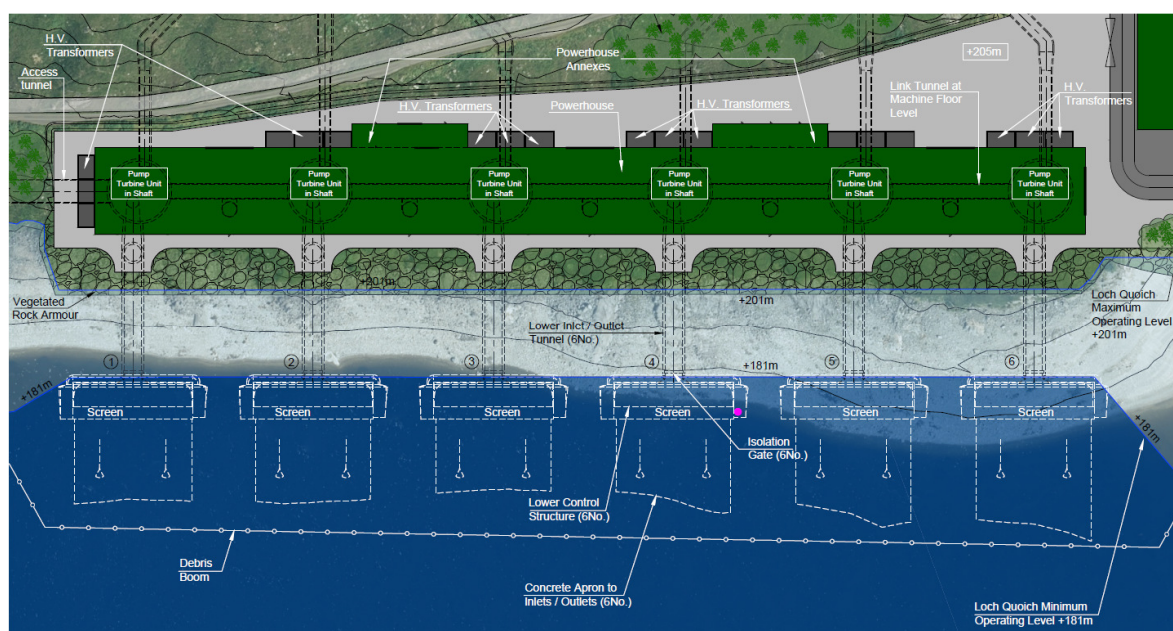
Powerhouse and Lower Control Works Plan (extract from Figure 2.11)
